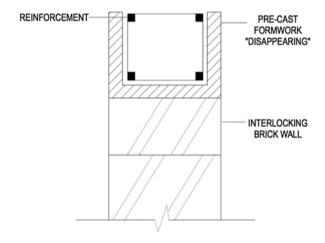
Cross section of a wall to illustrate use of appropriate disappearing beam formwork. (Source: Moses 2015)
